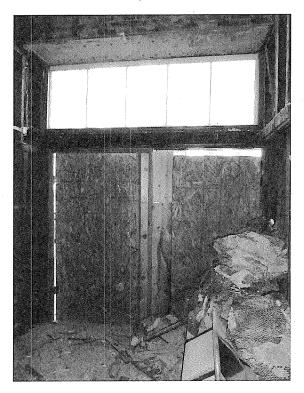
Interior view of storefront at second bay along Kearny Street. Note historic wood and glass transom above infilled plywood (photograph taken on 04/02/2018).
